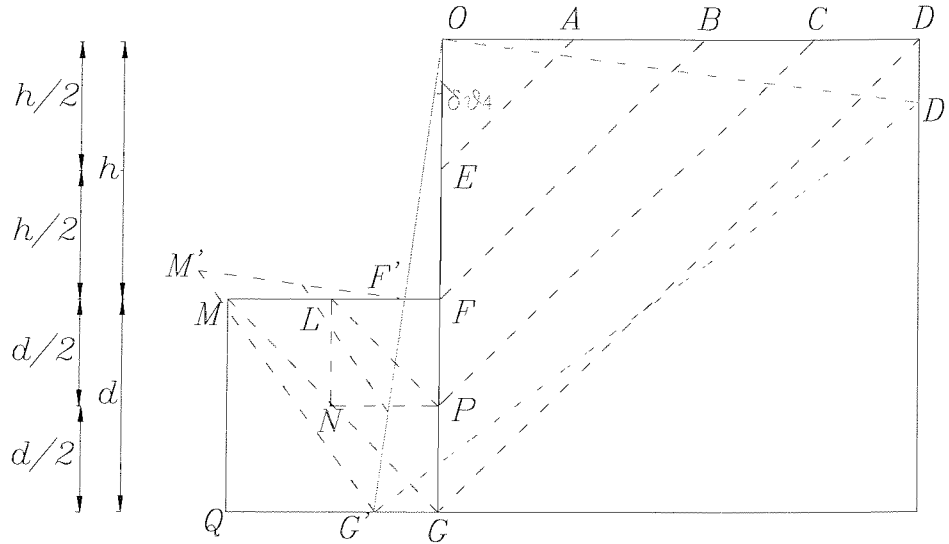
Stage 1 of the assumed wall movement – rotation of triangles ODG behind the wall and FMG in front of the wall.
